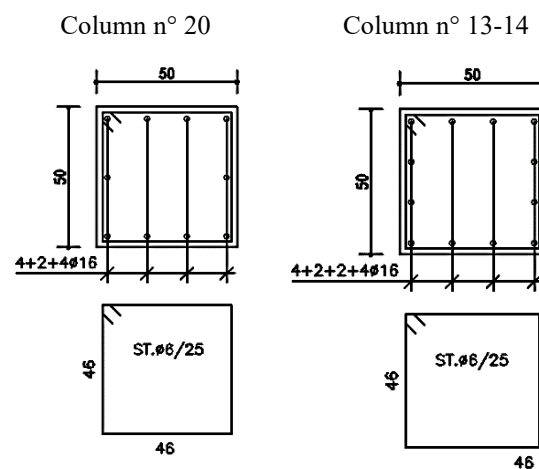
Reinforcements detailing on columns of the 3rd and 4th floors
